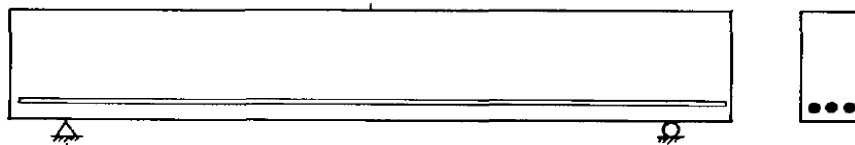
Reinforced concrete beam with longitudinal steel to resist flexure and shear but without transverse shear reinforcement
